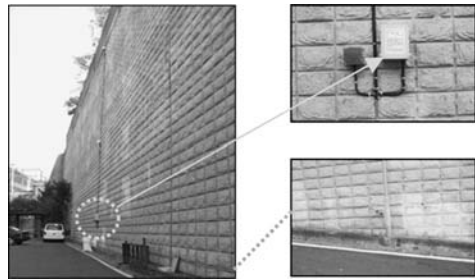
Monitoring system of the retaining wall of Ace Apartment in Ilsan.
